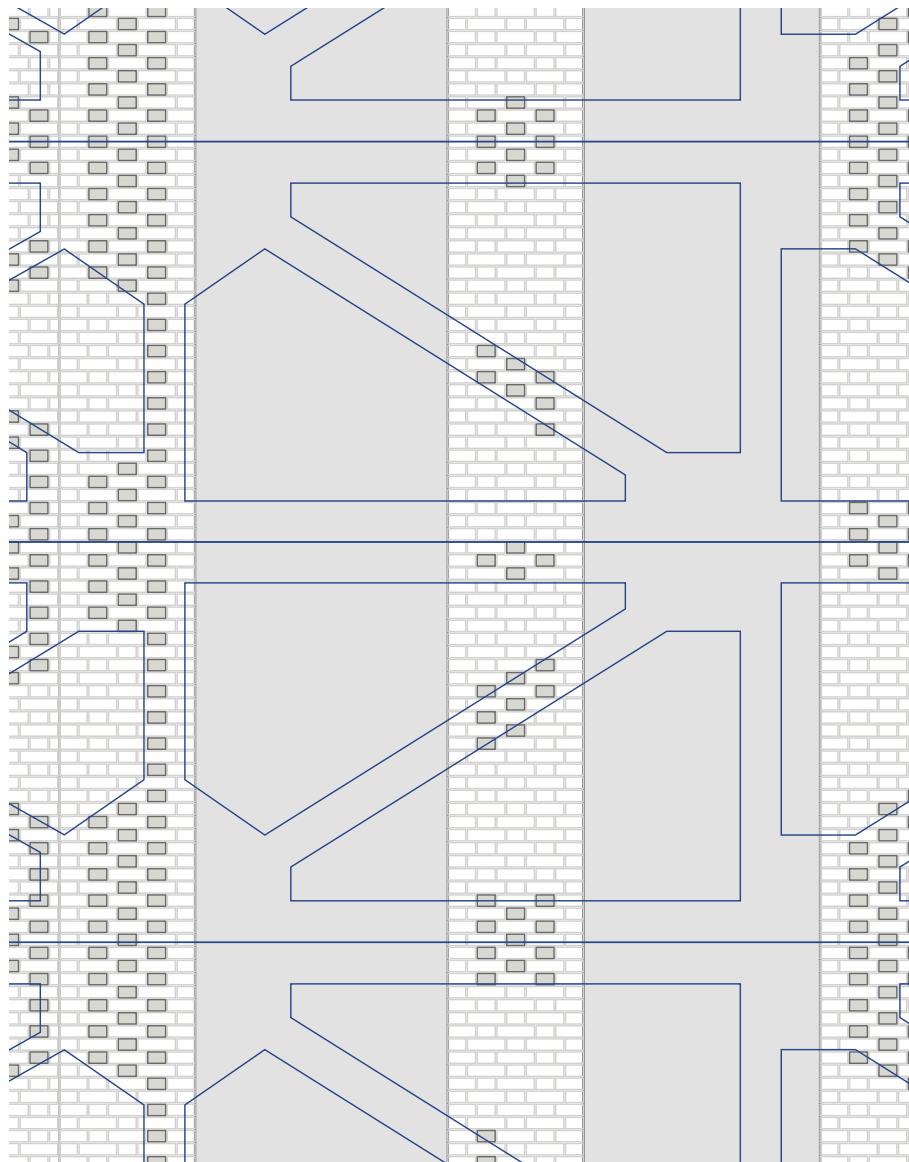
Linework overlaying the Leitch Truss pattern on the facade
